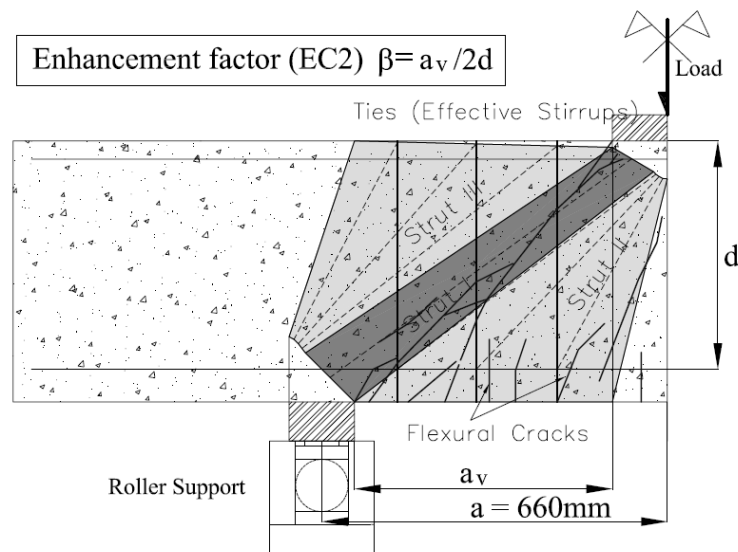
Typical crack pattern in short span beams (Beam AL3)
